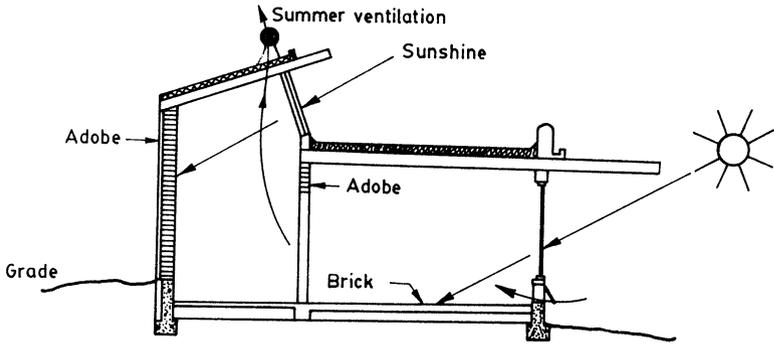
CROSS-SECTION OF WILLIAMSON HOUSE (From SANDIA[29])
